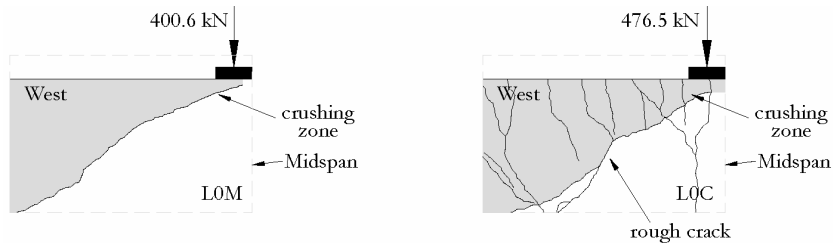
Critical loading zones at failure— specimens L0C and L0M
